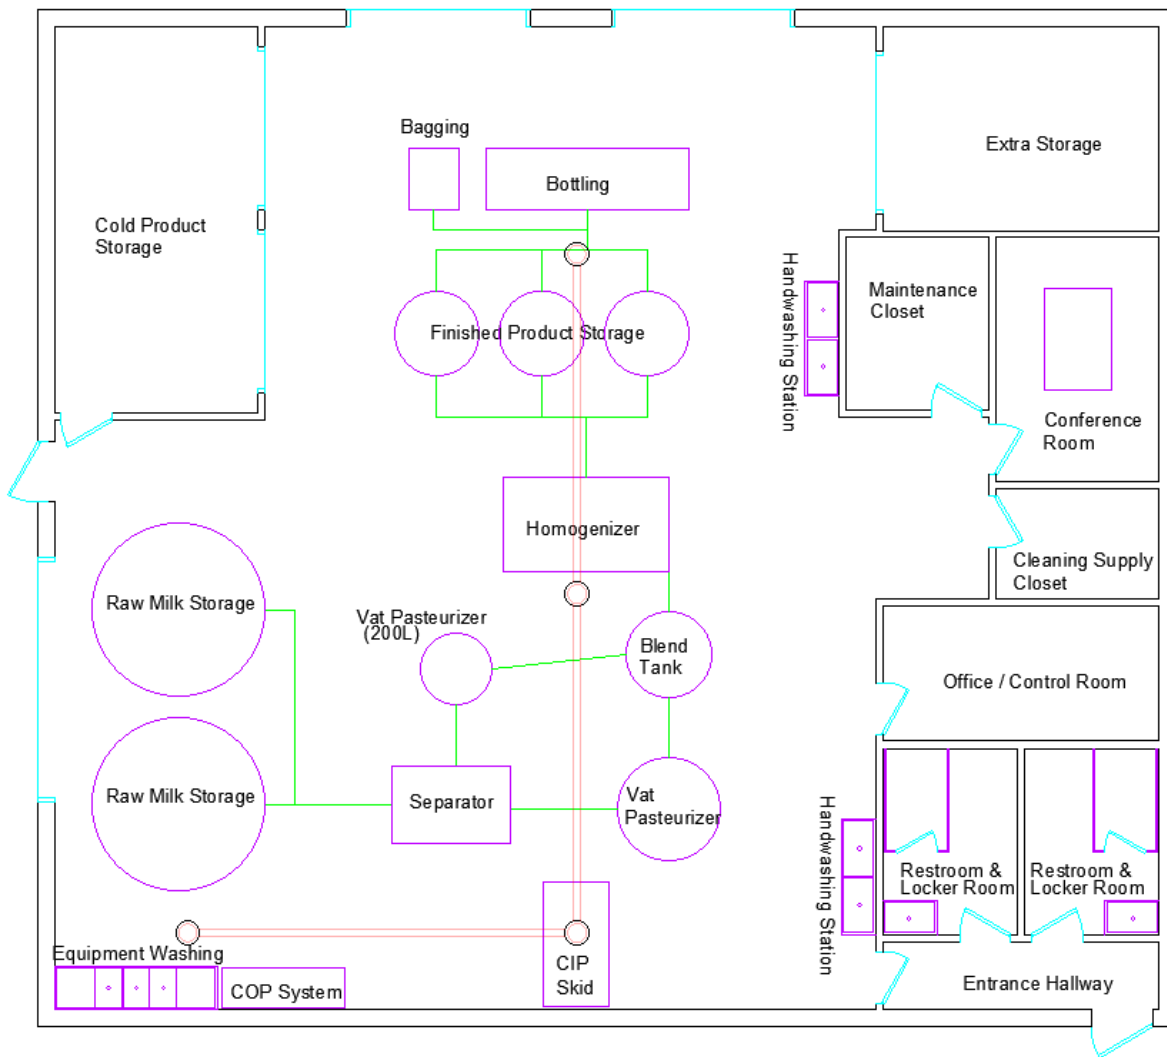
View of the Dairy Processing Plant Floor Layout without dimensions.
